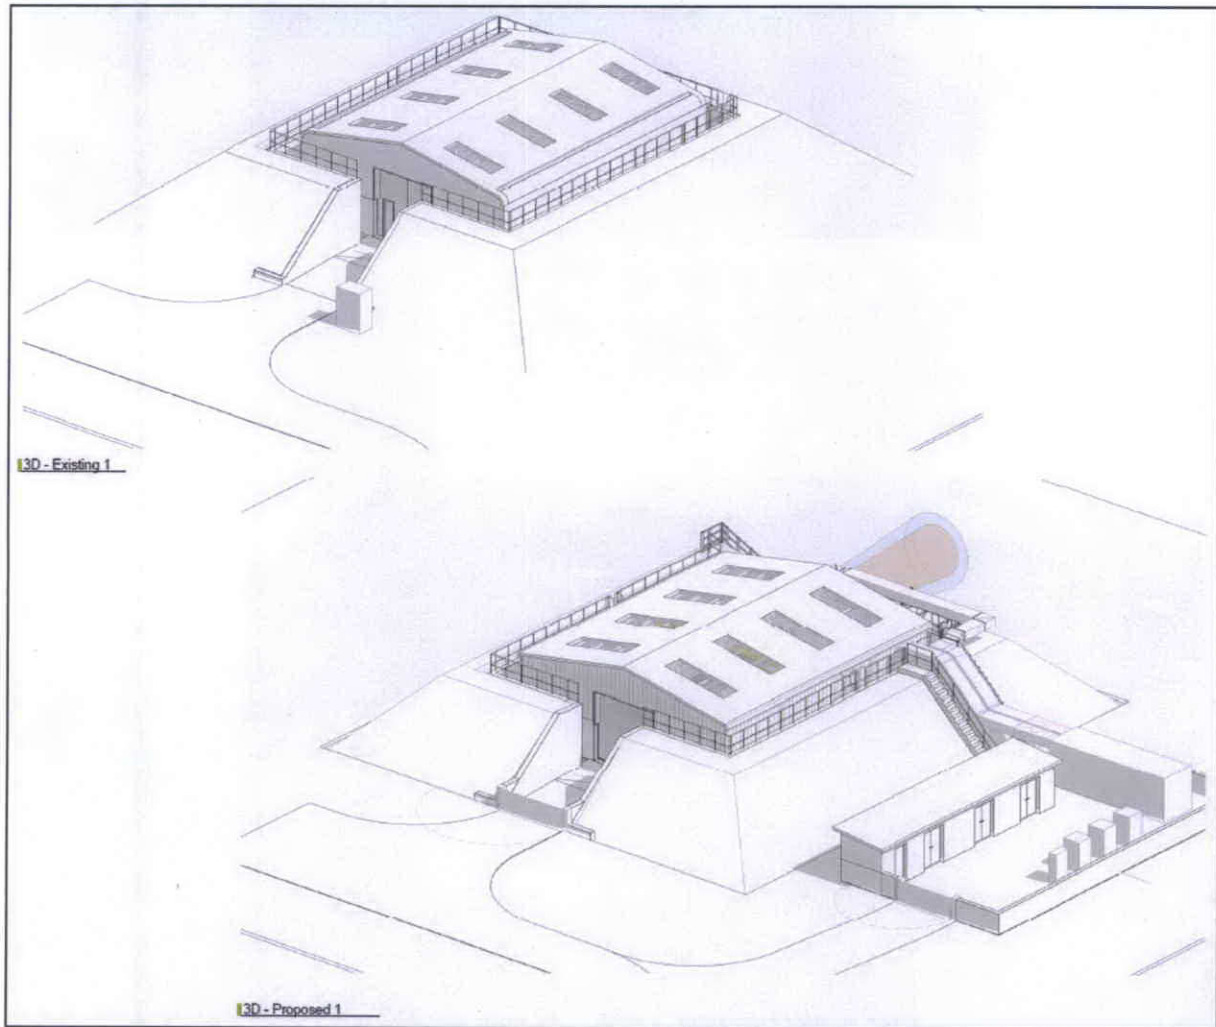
Existing and proposed views of Building 71 (extract from drawing IDA-5000)
